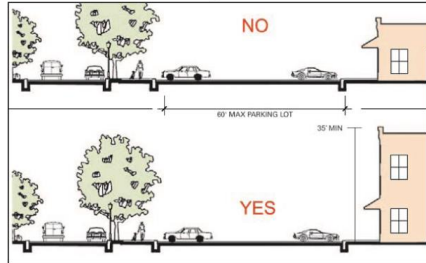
This image depicts how buildings in conventional areas may locate off-street parking in the area between the building's façade and the street it fronts, provided the building is three stories in height or greater.
